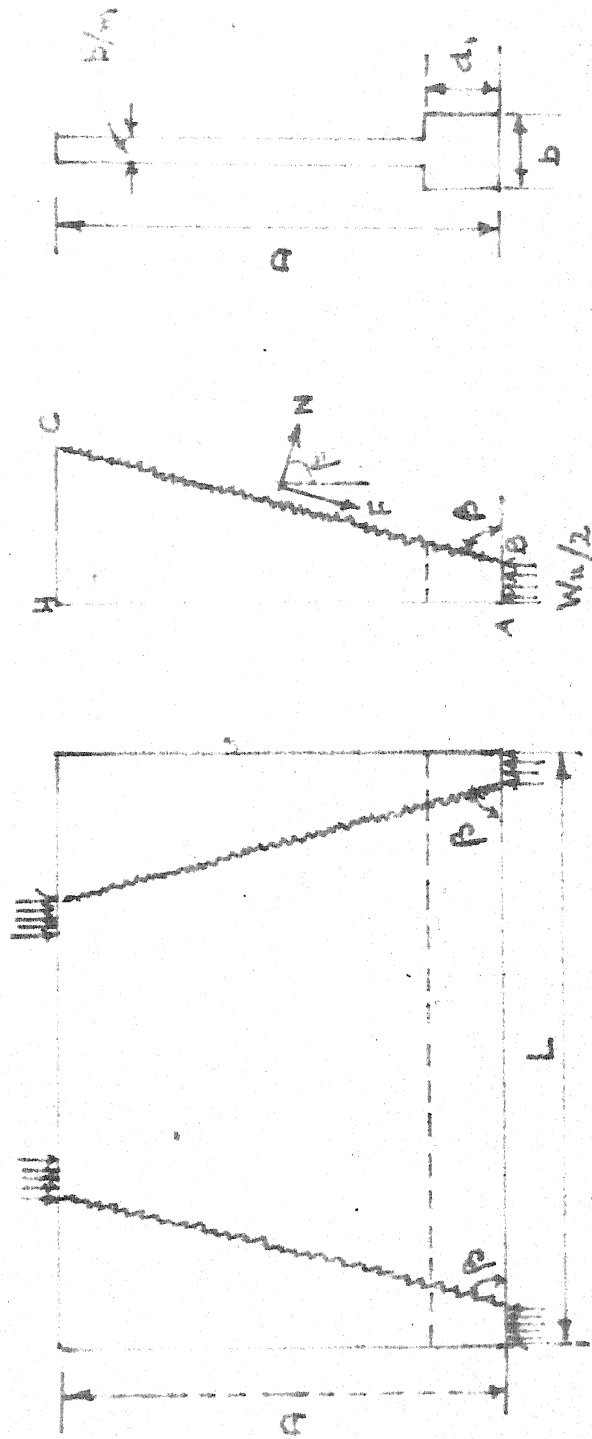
SHEAR FAILURE OF BRICK WALLS ON R.C. BEAMS
